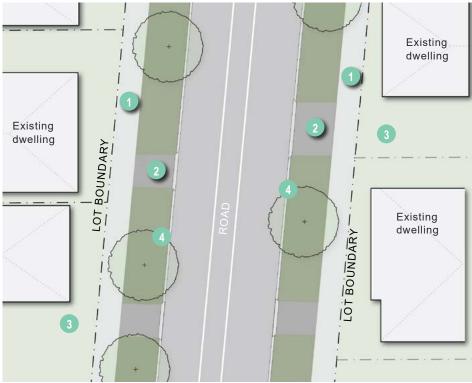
Typical Riverside Precinct streetscape illustrating proposed footpath and crossover materials.
